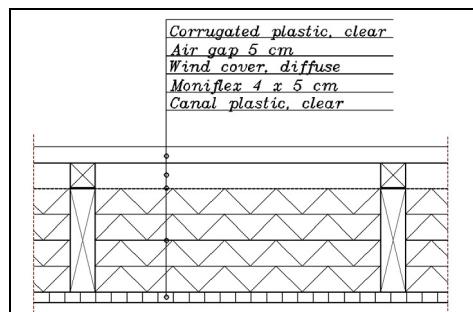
Horizontal section through the translucent wooden wall in the Mæla school, Skien/Norway.
